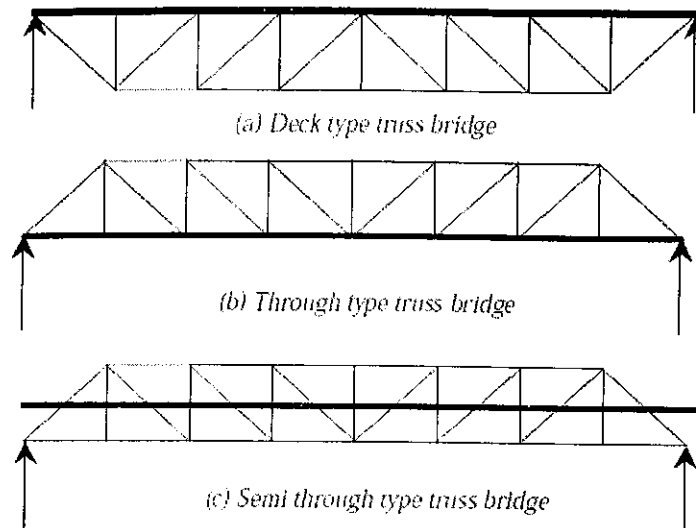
Typical Deck type, Through and Semi-Through type Truss bridges
